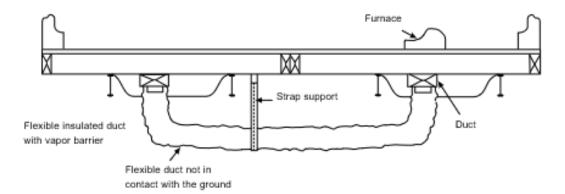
Crossover Duct Installation with Two Connecting Ducts.
